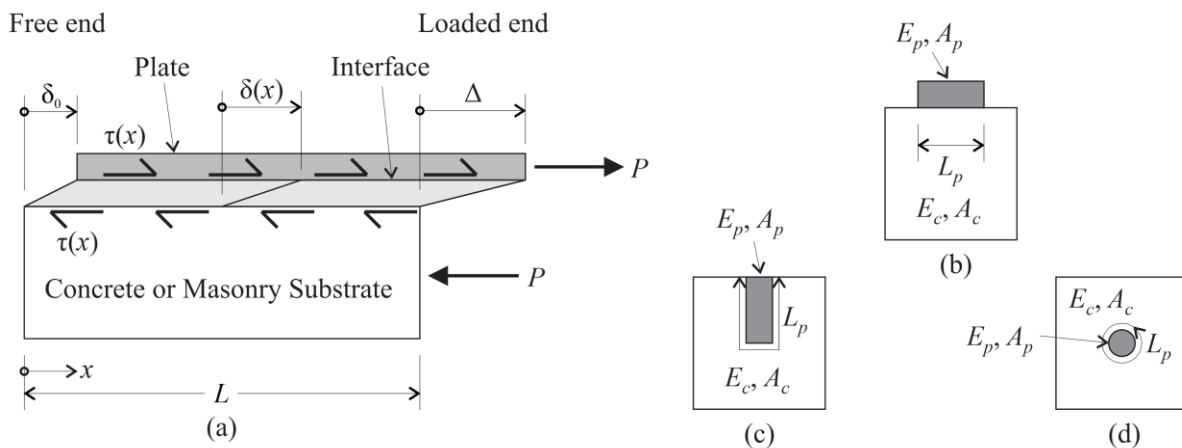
Plate-to-substrate composite system subjected to the push-pull loading condition; (a) generic longitudinal section, and cross sections for (b) EB plate, (c) NSM plate, and (d) embedded bar.
